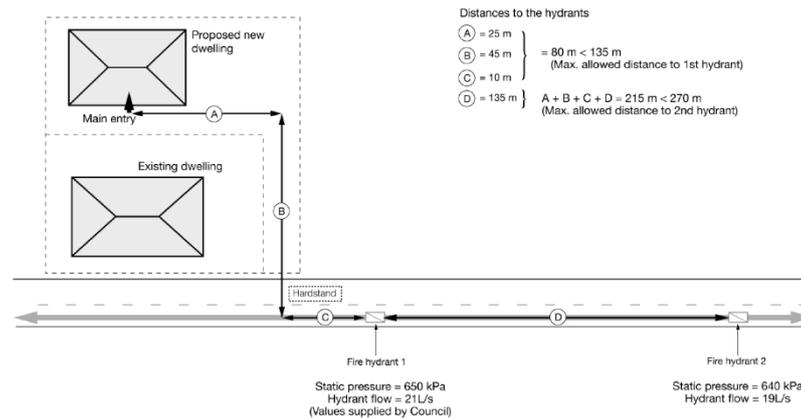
Firefighting water supply requirements for a non-sprinklered house with access to a reticulated supply
